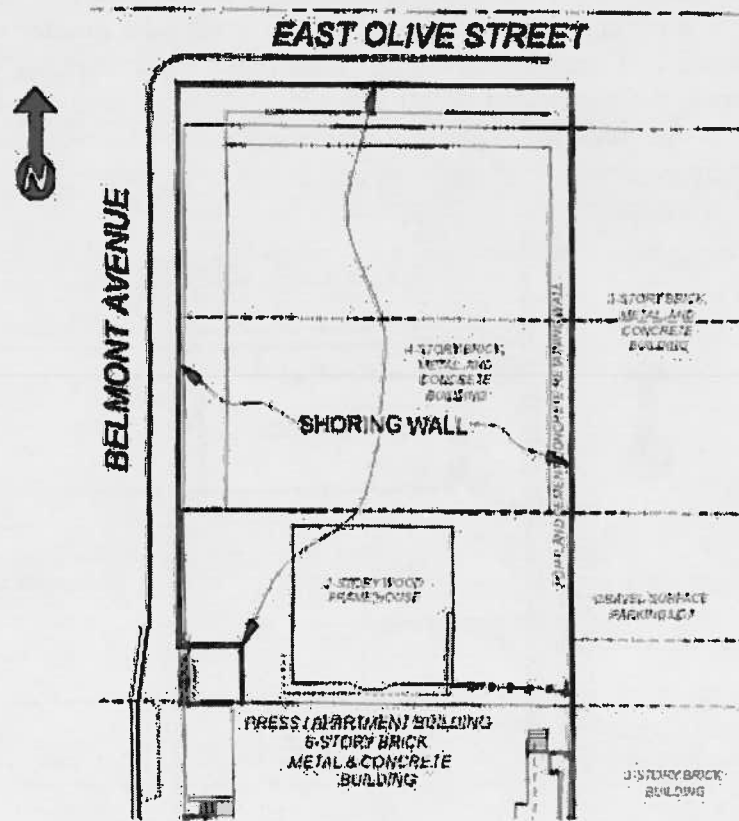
Footprint Of The Press II Excavation Shoring Wall. Existing Features Shown From The Topographical Survey Map Prepared For This Site
